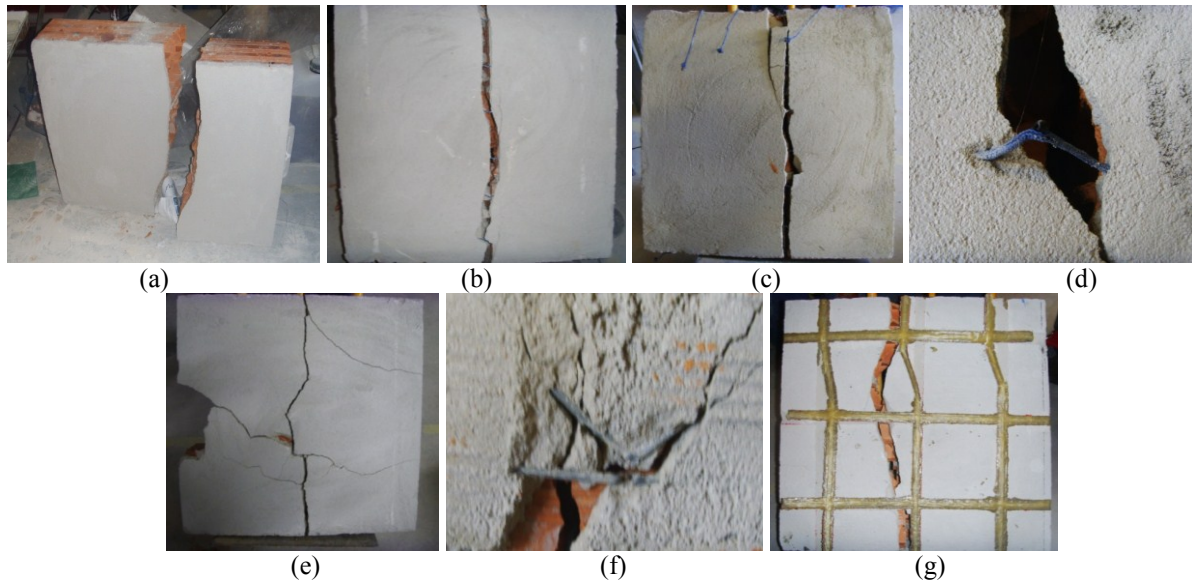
Failure modes of the masonry specimens; (a) unreinforced masonry specimens; (b) glass braided mesh strengthening (c) carbon braided mesh strengthening; (d) detail of the crack and carbon braided yarn; (e) masonry with truss type bed reinforcement; (f) detail of the failure of the weld of the reinforcement; (g) wrap glass reinforcement
